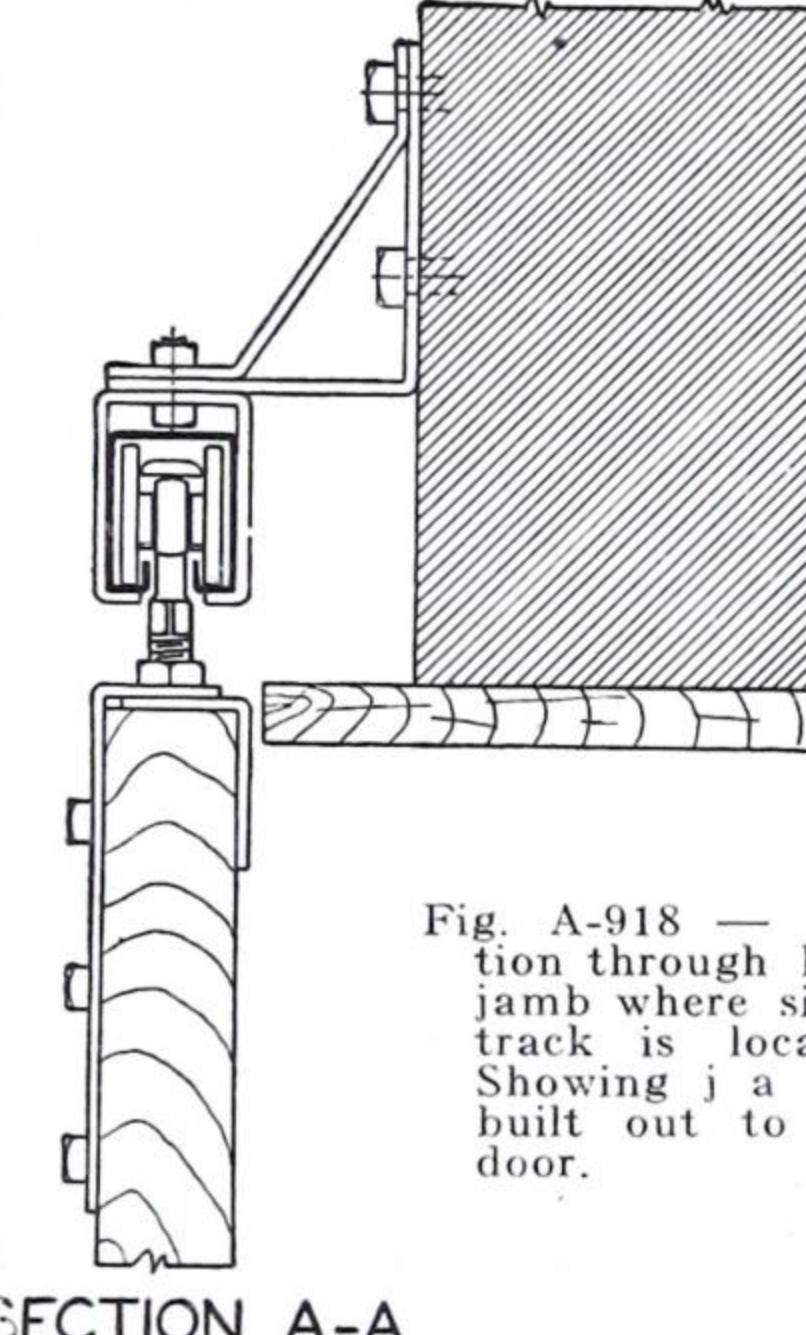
Section through head jamb where single track is located. Showing jamb built out to the door.
